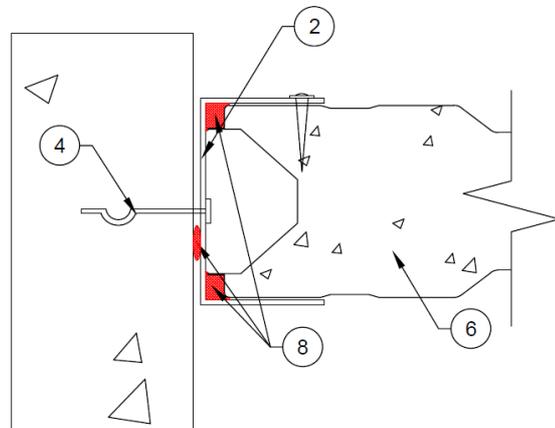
Female Panel End Detail for Vertical Speedpanel Wall
